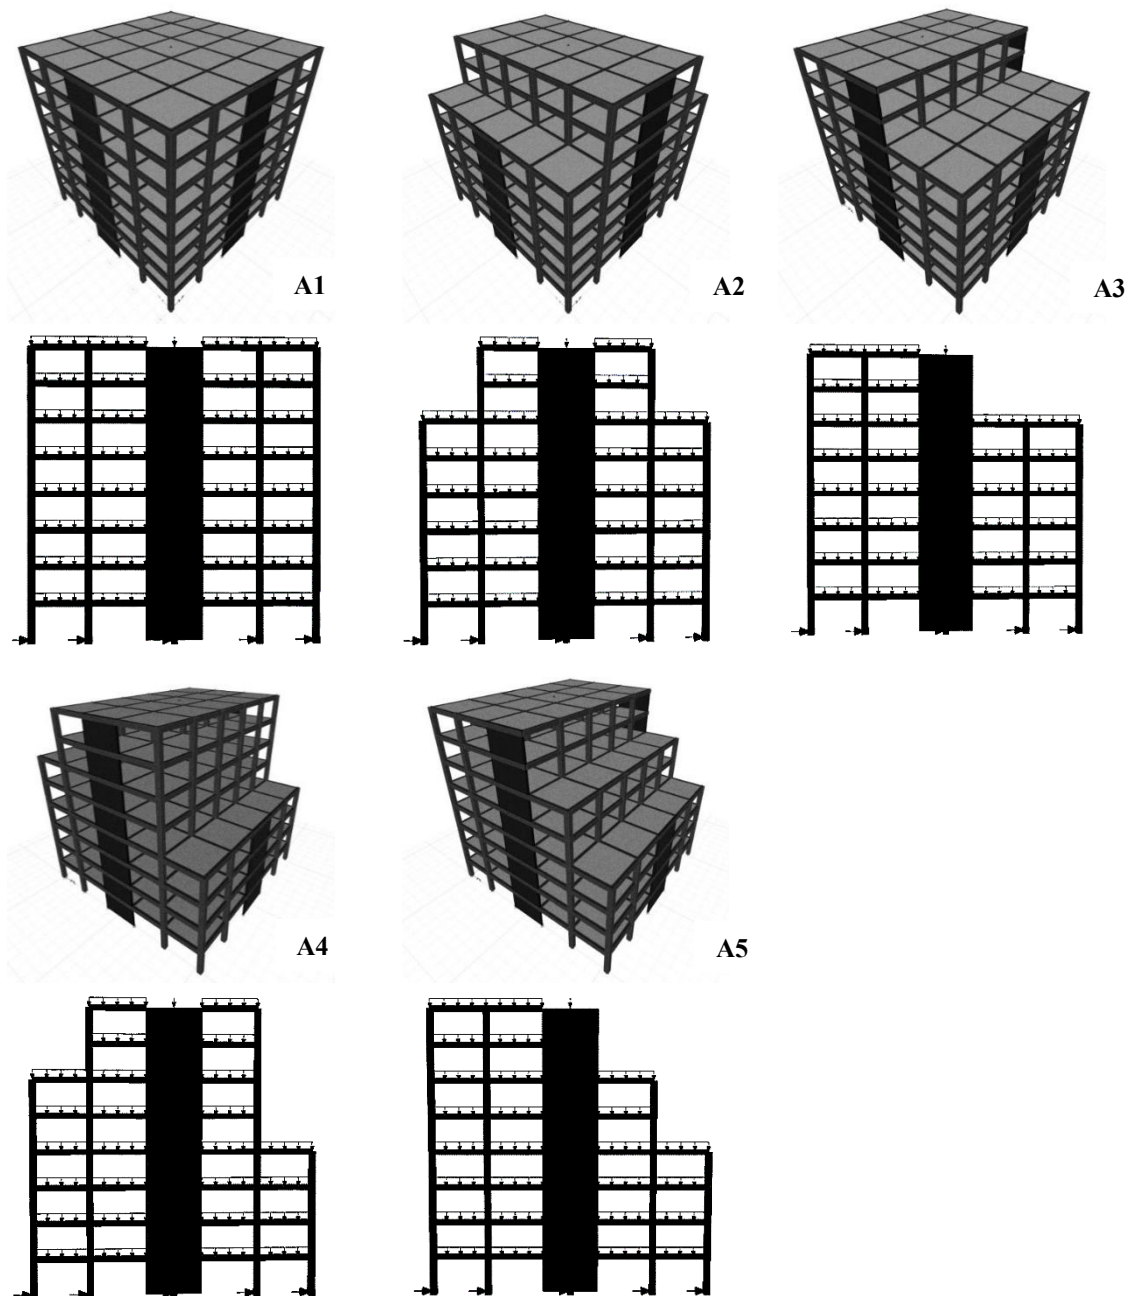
3D view and elevation of RC dual-frame buildings with and without setbacks
